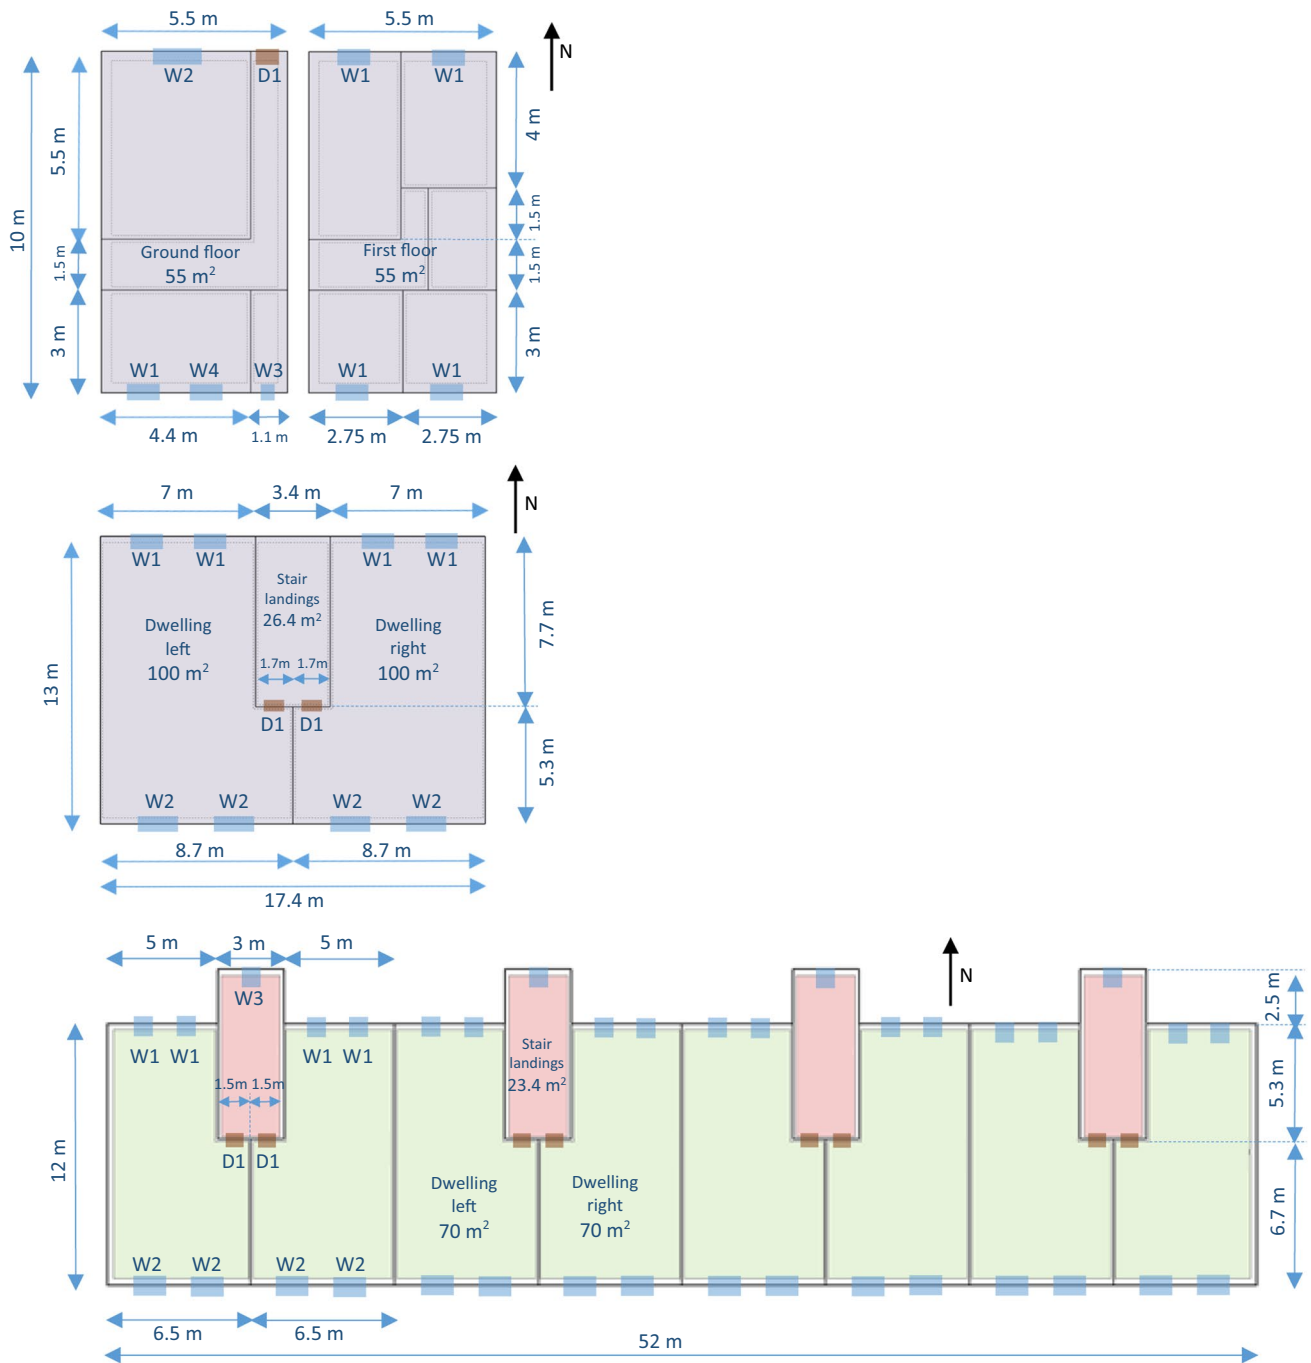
Ground floor plan (left) and first-floor plan (right) of the building type T1^a (above) and typical floor plan of the building types T2^b (center) and T3^c (below). ^aHeight from the floor of the plant (z) and windows dimensions (width \times height) in T1: W1: $z = 1$ m, 1 m \times 1 m; W2: $z = 1$ m, 1.3 m \times 1 m; W3: $z = 1.5$ m, 0.4 m \times 0.4 m; W4: $z = 0$ m, 1 m \times 1.8 m. Doors dimensions (width \times height) in T1: D1: 0.8 m \times 2 m. ^bHeight from the floor of the plant (z) and windows dimensions (width \times height) in T2: W1: $z = 1$ m, 1.3 m \times 1 m; W2: $z = 1$ m, 1.4 m \times 1.4 m. Doors dimensions (width \times height) in T2: D1: 0.8 m \times 2 m. The ground floor in T2 consists of two premises
